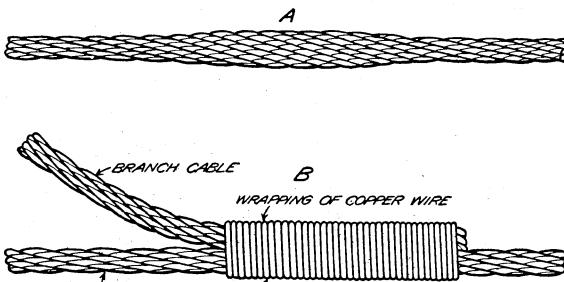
Other methods of forming conductor joints. A, end-to-end joints of copper cable. B, side branches
